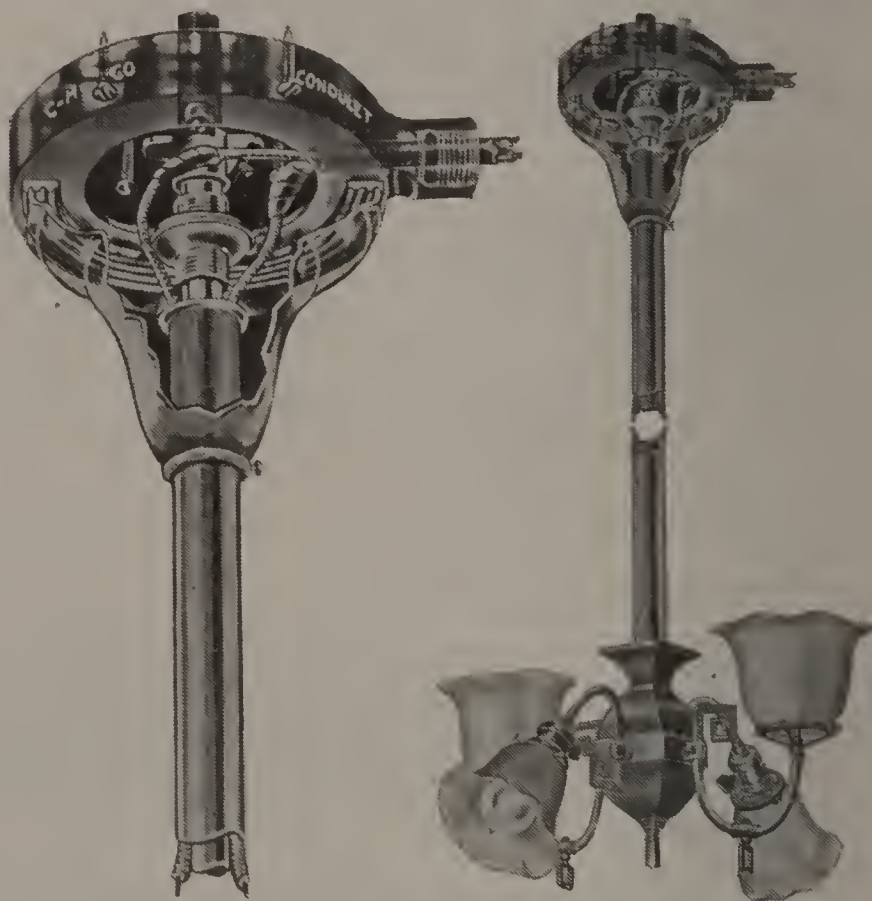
COMBINATION GAS AND ELECTRIC FIXTURE.
